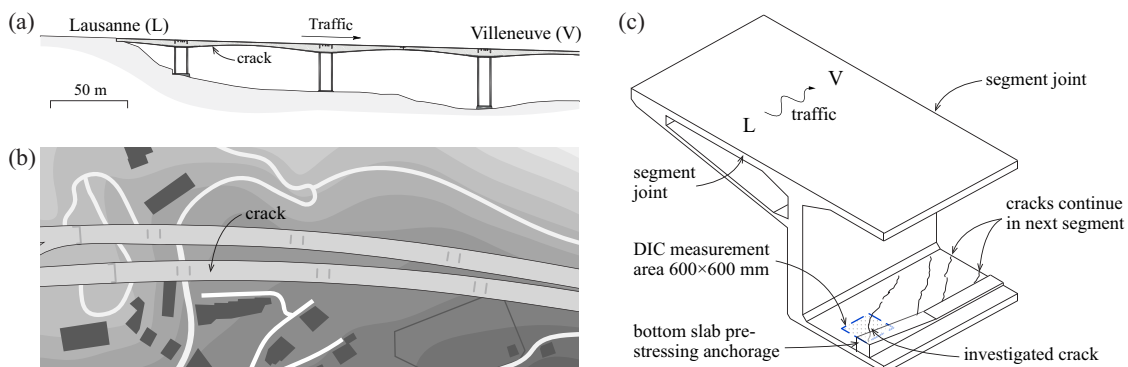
In-situ application: (a) partial elevation and (b) partial plan of the Chillon Viaducts; and (c) segment of interest with investigated crack.
